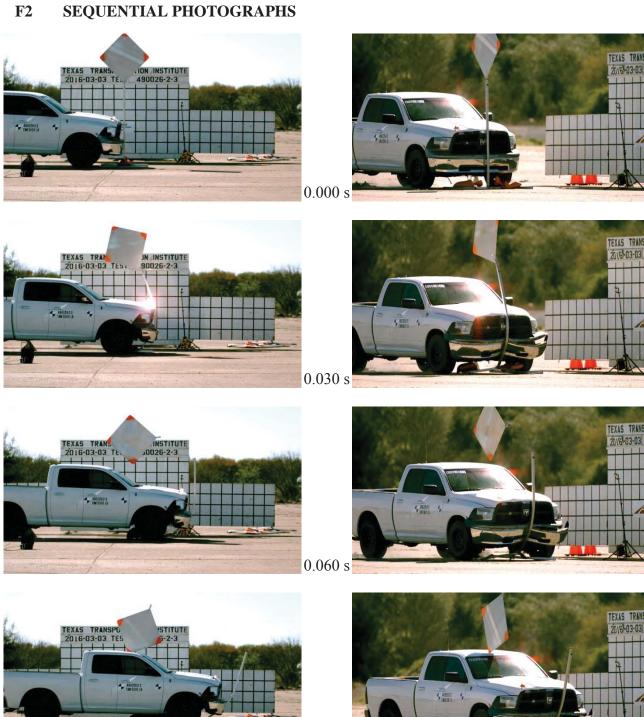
Sequential Photographs for Test No. 490026-2-3 (Perpendicular and Oblique Views).
